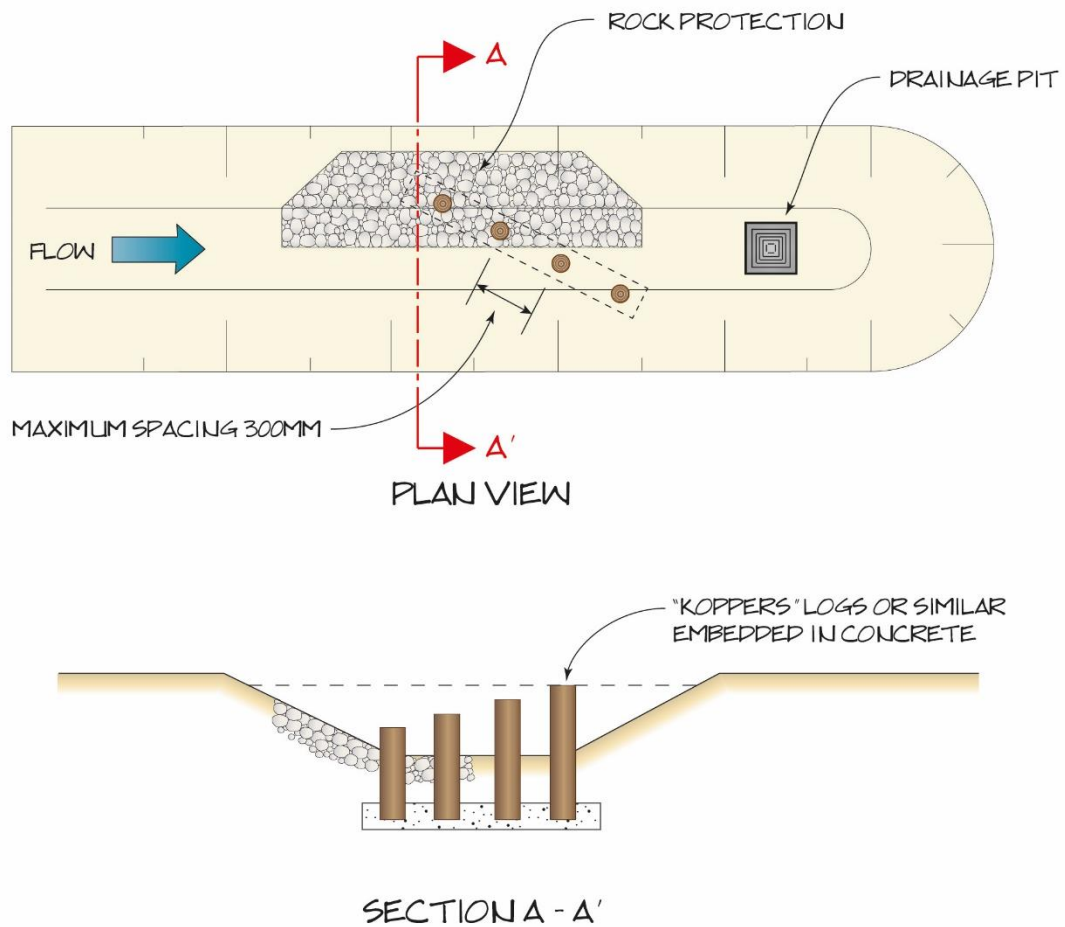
Debris Barrier Concept Sketch – Plan and Section A-A
